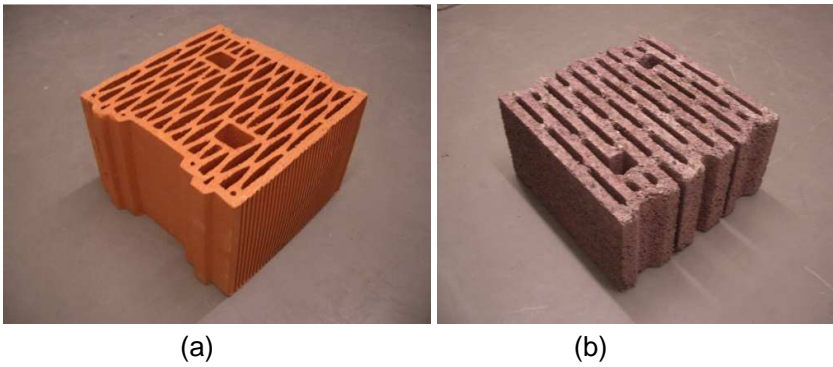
Masonry units developed: (a) clay unit and (b) lightweight concrete unit
